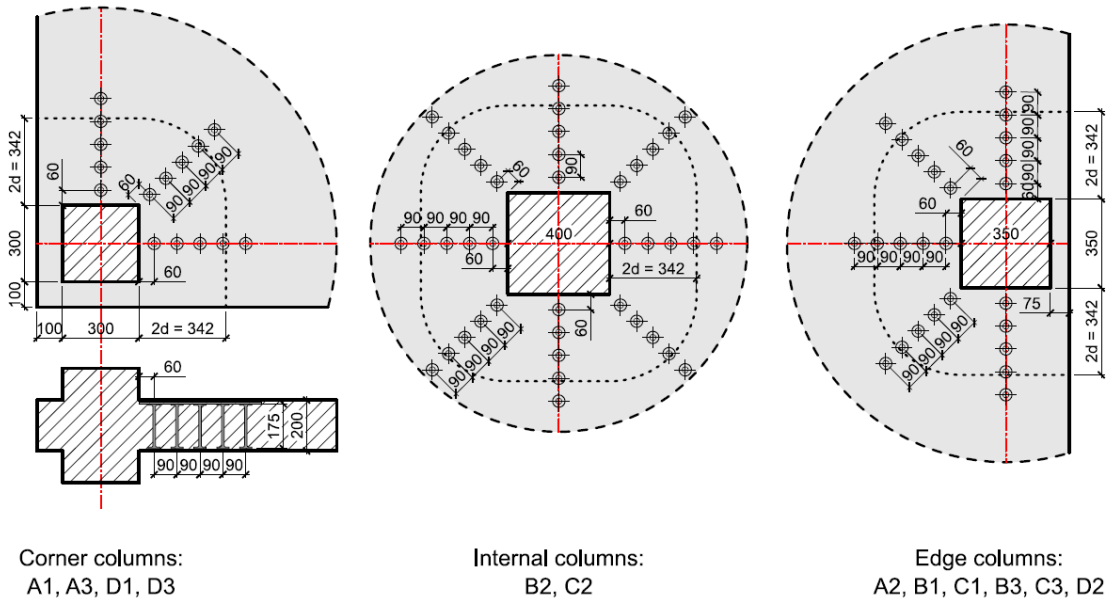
SlabSTRESS layout of shear reinforcement at slab-column connections at the 2nd floor.
